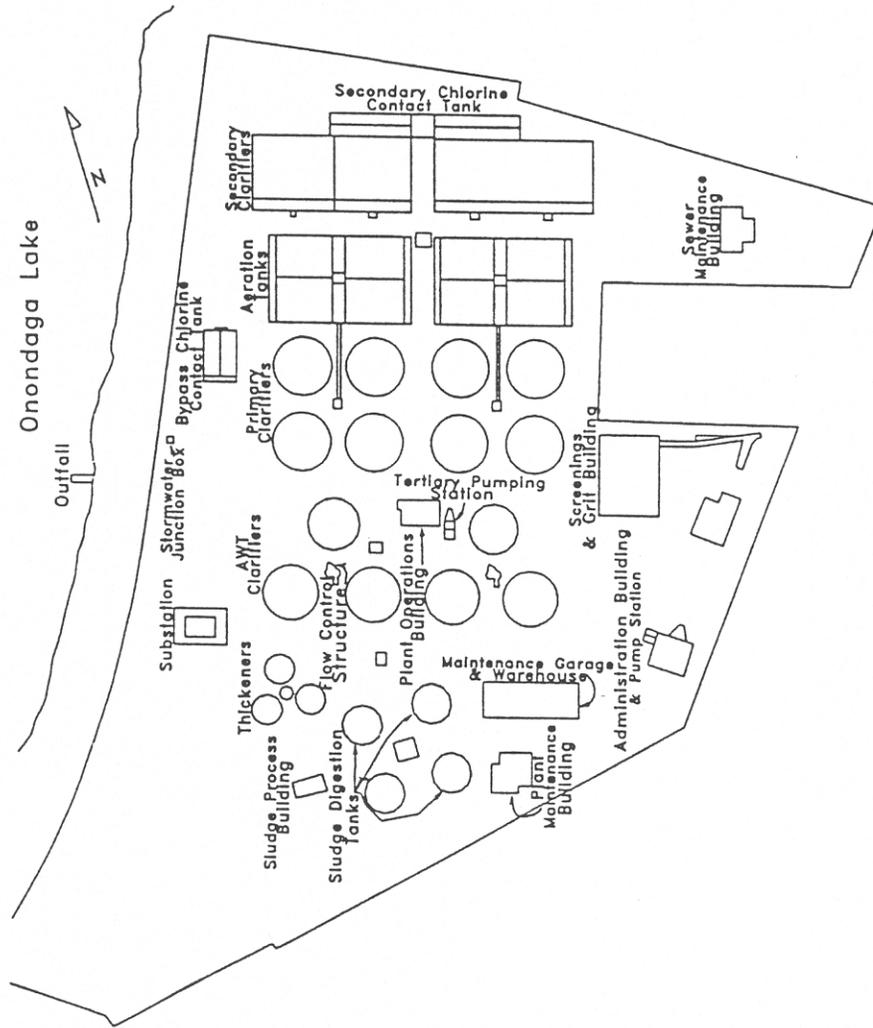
Layout of the Syracuse Metropolitan wastewater treatment plant (METRO).
